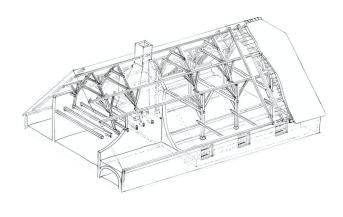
Timber-framed construction of an aisled hall house (Rijksdienst voor het Cultureel Erfgoed, 2015).
